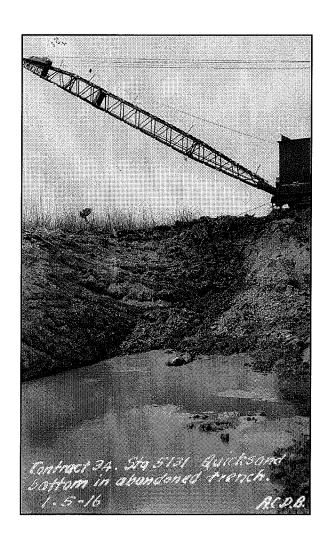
Groundwater piping into the base of the aqueduct trench at Mile 97.2. (Construction Photograph No. 373)
